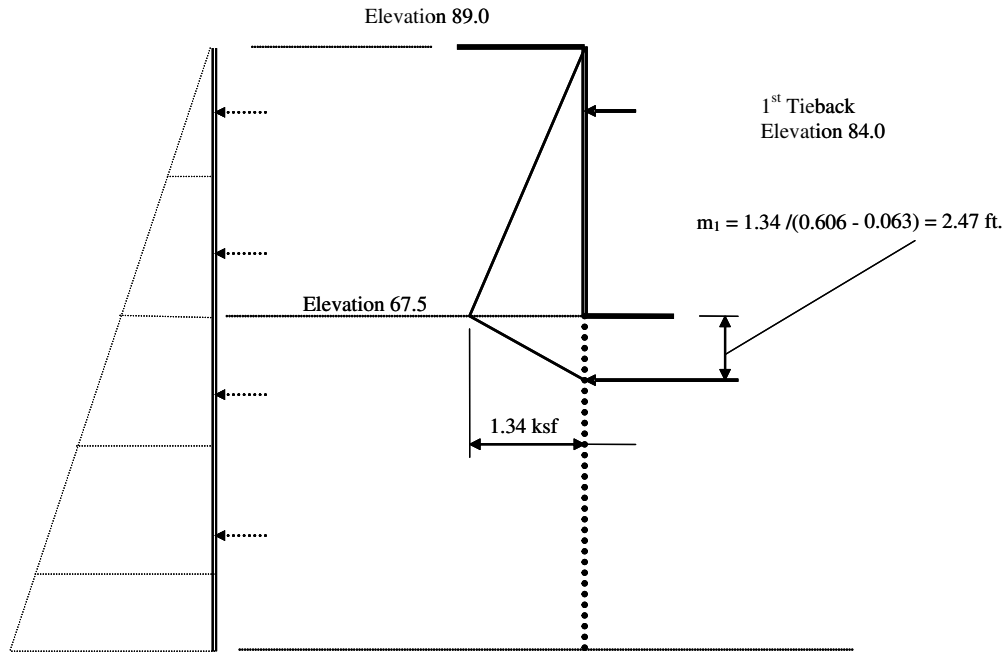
Excavate to elevation 67.5 – second stage excavation
